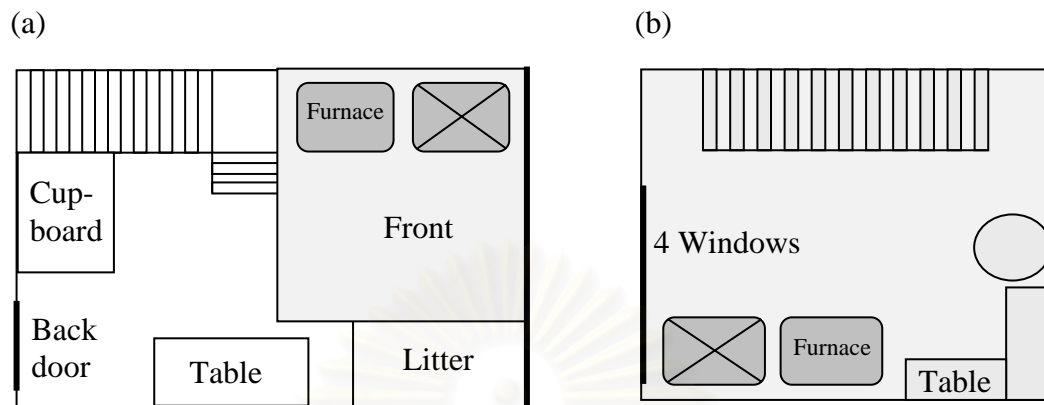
(a) Top view plan of the first floor and (b) mezzanine engaged for ruby heat-treatment in Factory B.
